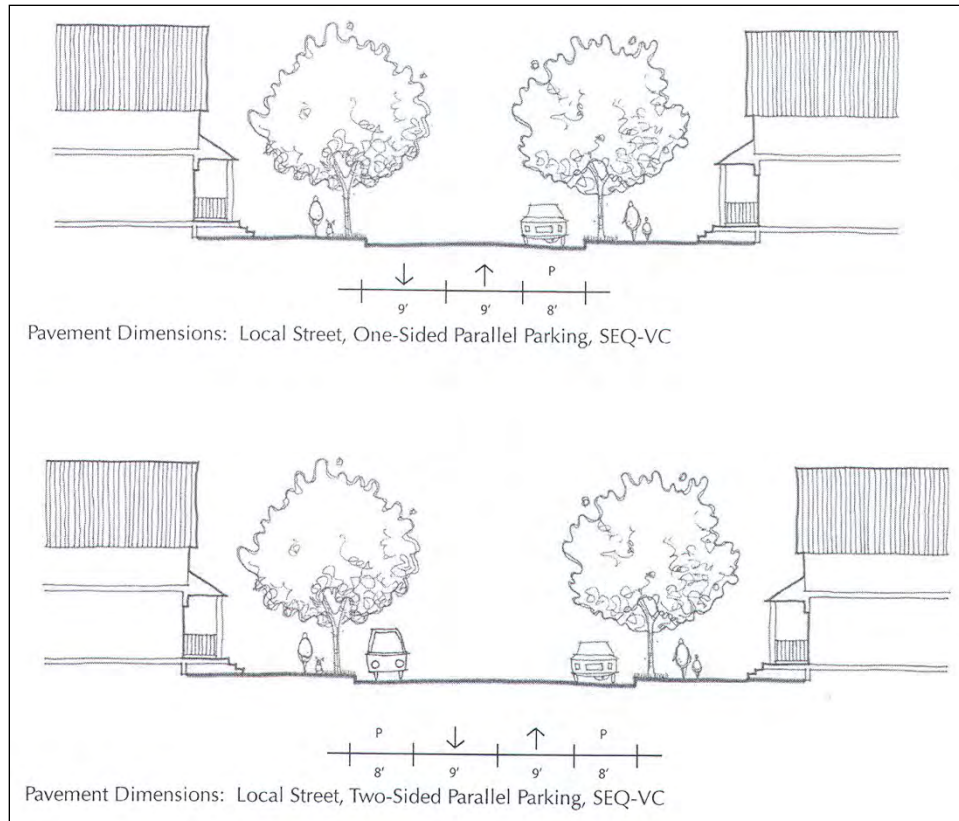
Pavement Dimensions: Local Streets, SEQ-VC
